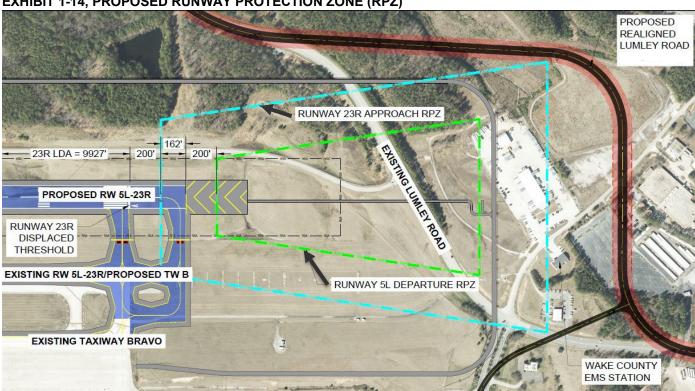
, PROPOSED RUNWAY PROTECTION ZONE (RPZ)
